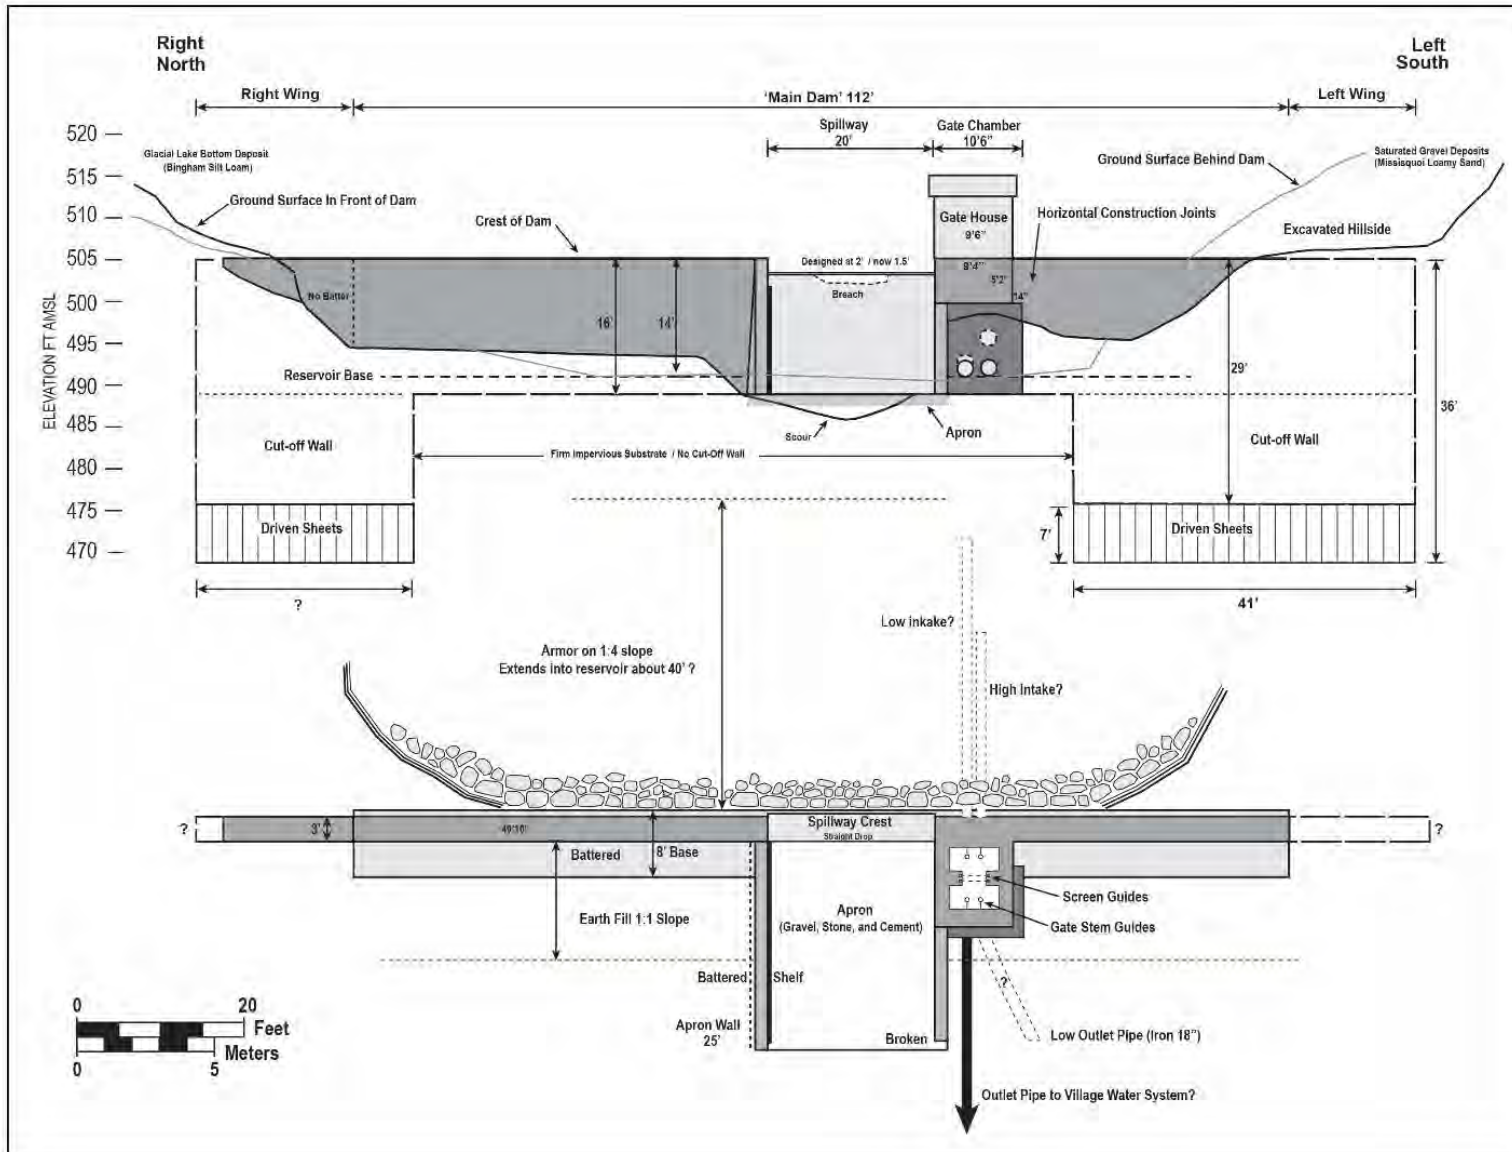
Elevation and plan of the Trout Brook Reservoir Dam, Bakersfield, Vermont.
